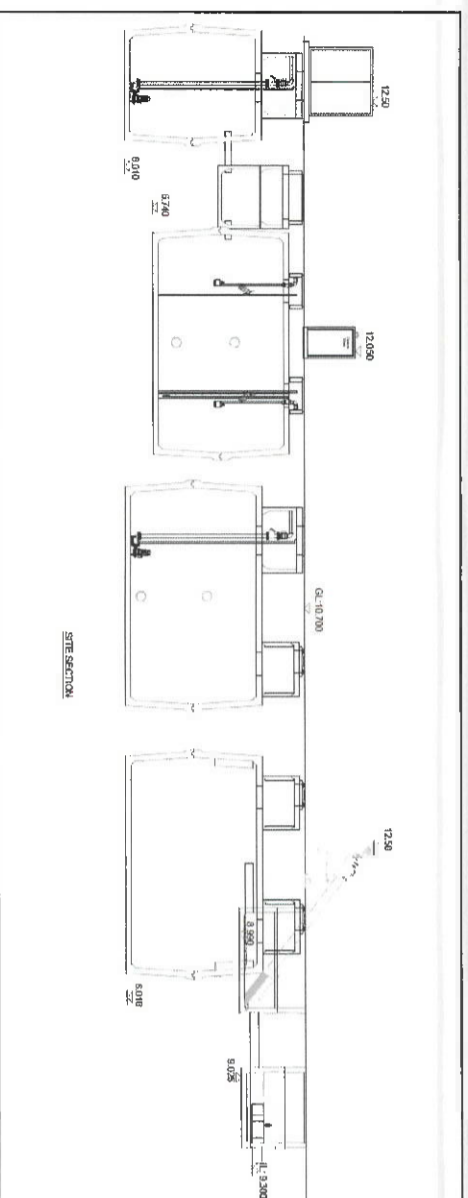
Proposed WwTP Site Section layout. (Source: JB Barry & Partners.)
